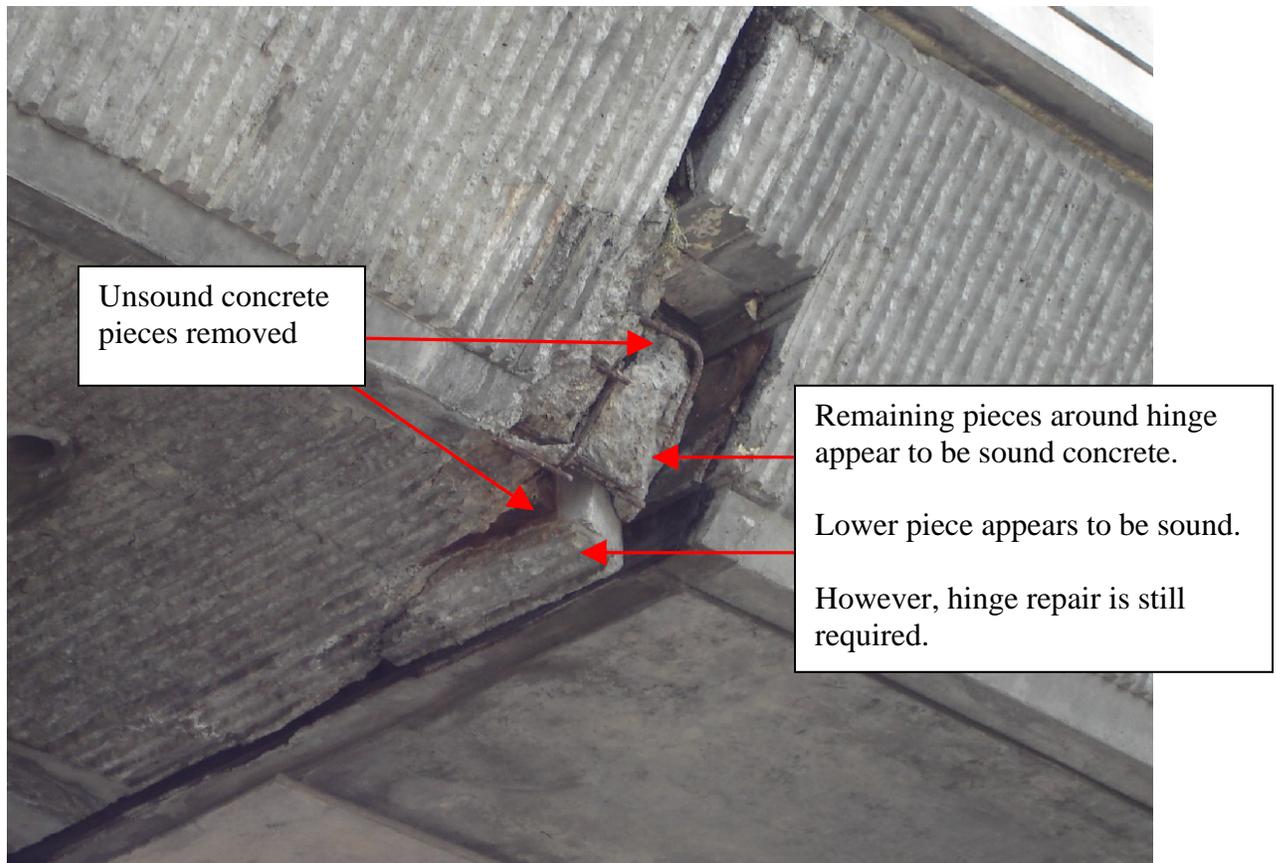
“After” Photo of Two Unsound Concrete Pieces Removed at Location 1
